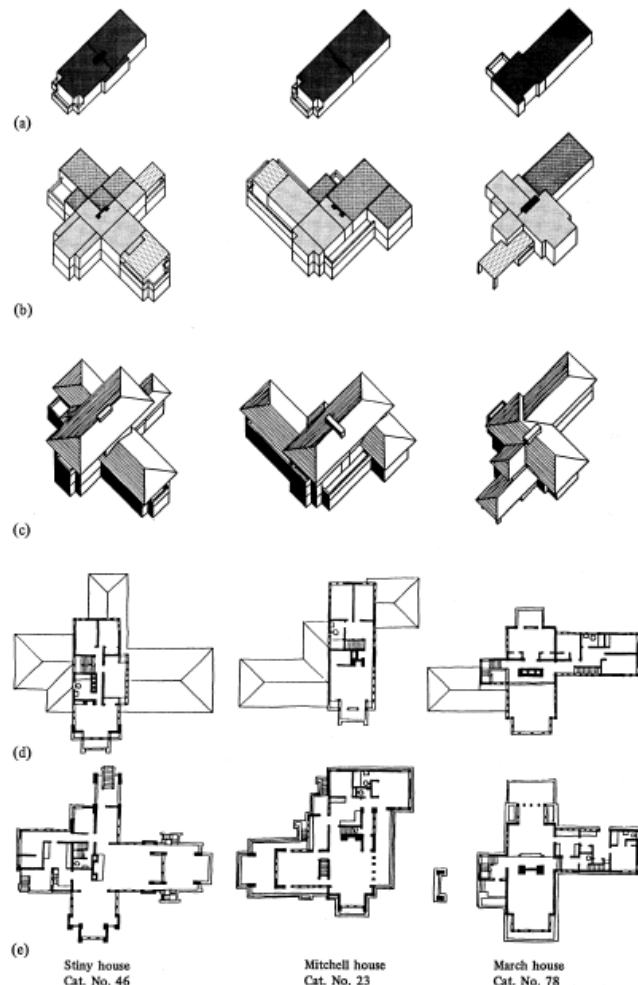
Three new designs as generated by the grammar: (a) bedroom level, (b) main floor level, (c) external form; and the detailed plans (d) bedroom floor plan, (e) main floor plan.
